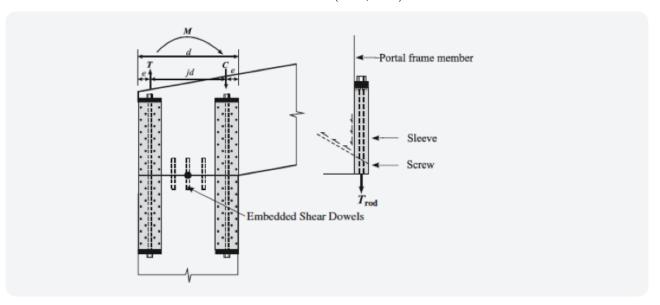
Quick Connect. (Image credit: Structural Timber Innovation Company)
